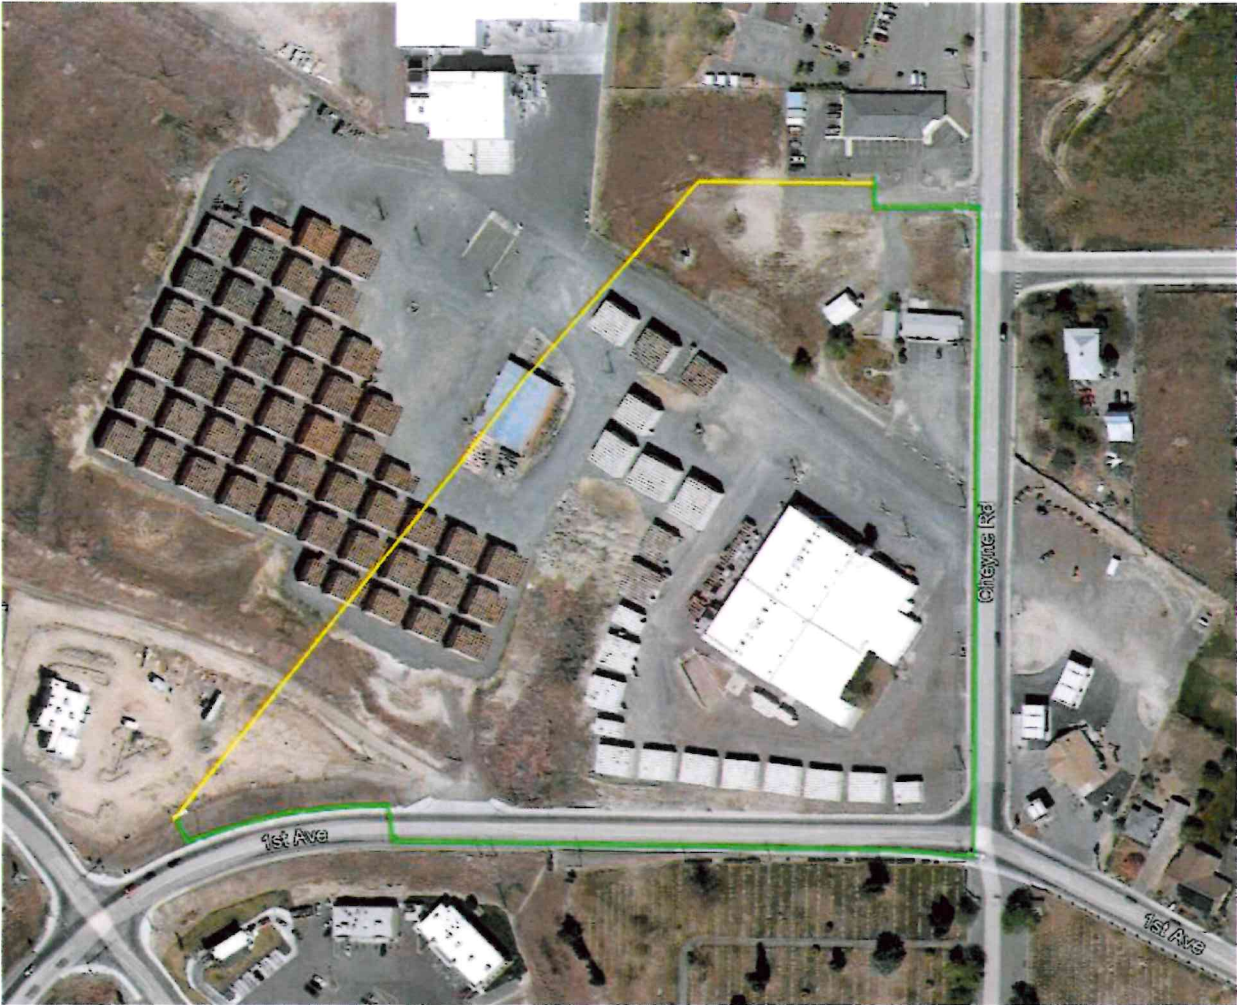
Overall view of the proposed Zillah HP Replacement (Green) and existing Zillah HP (Yellow) alignment.
